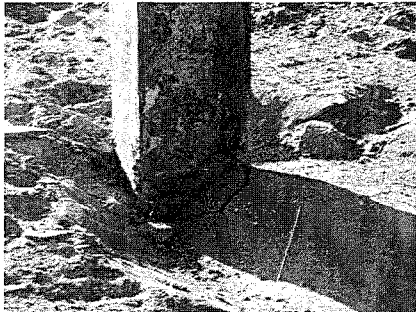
Surface cracking surrounding the pile extension (Photo: Chadwell).
